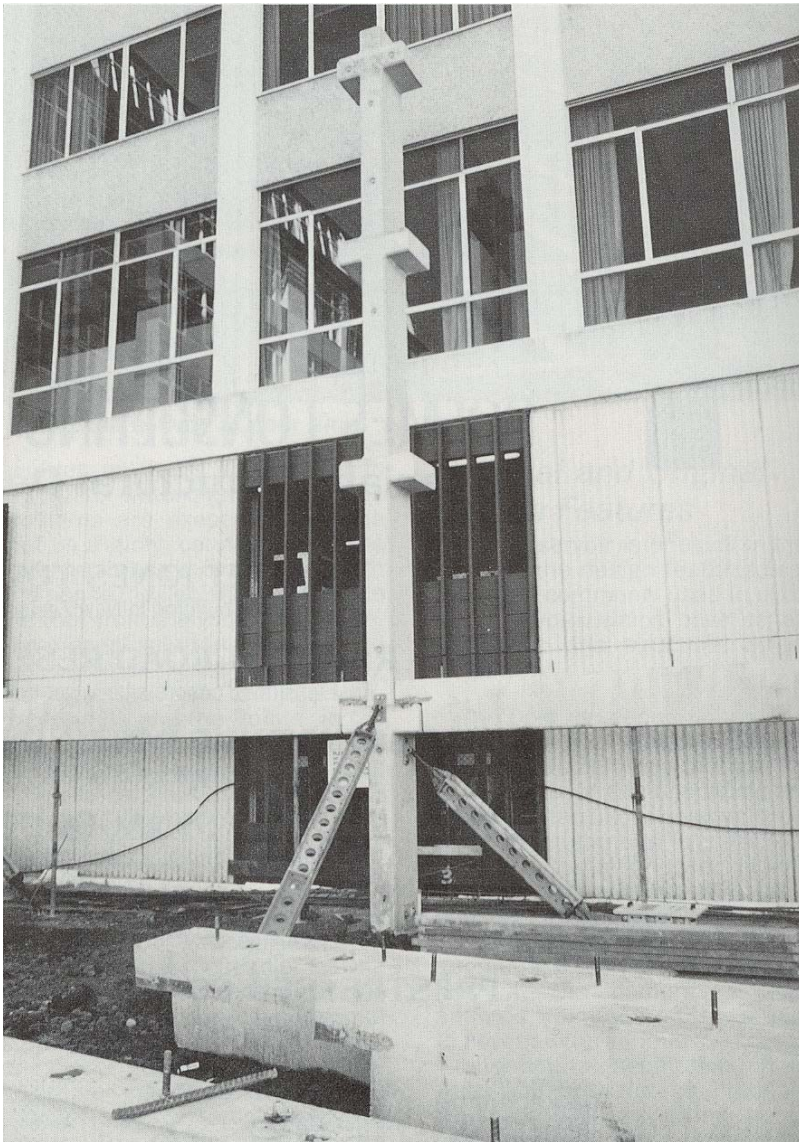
One of the 32 no. full height precast concrete columns with integral corbels to support precast concrete floor beams. Beams and columns only provide gravity support, with lateral support provided by concrete shear walls.
